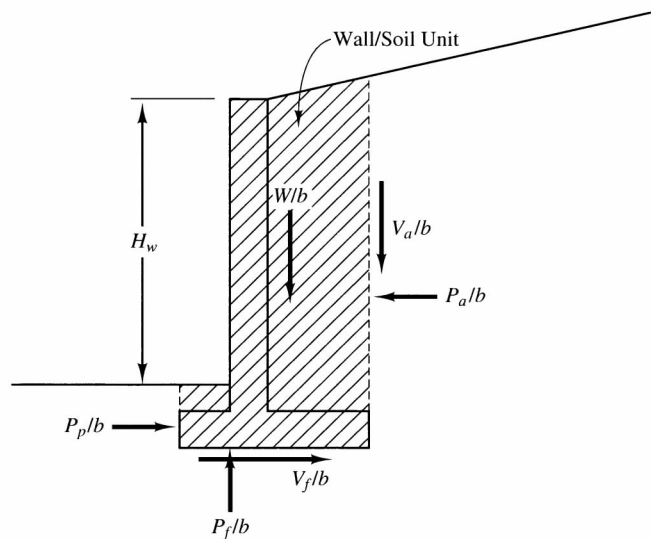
Forces acting between a cantilever retaining wall and the ground. The wall, footing, and backfill soil immediately above the footing form the wall-soil unit, which is used to perform external stability analyses.
